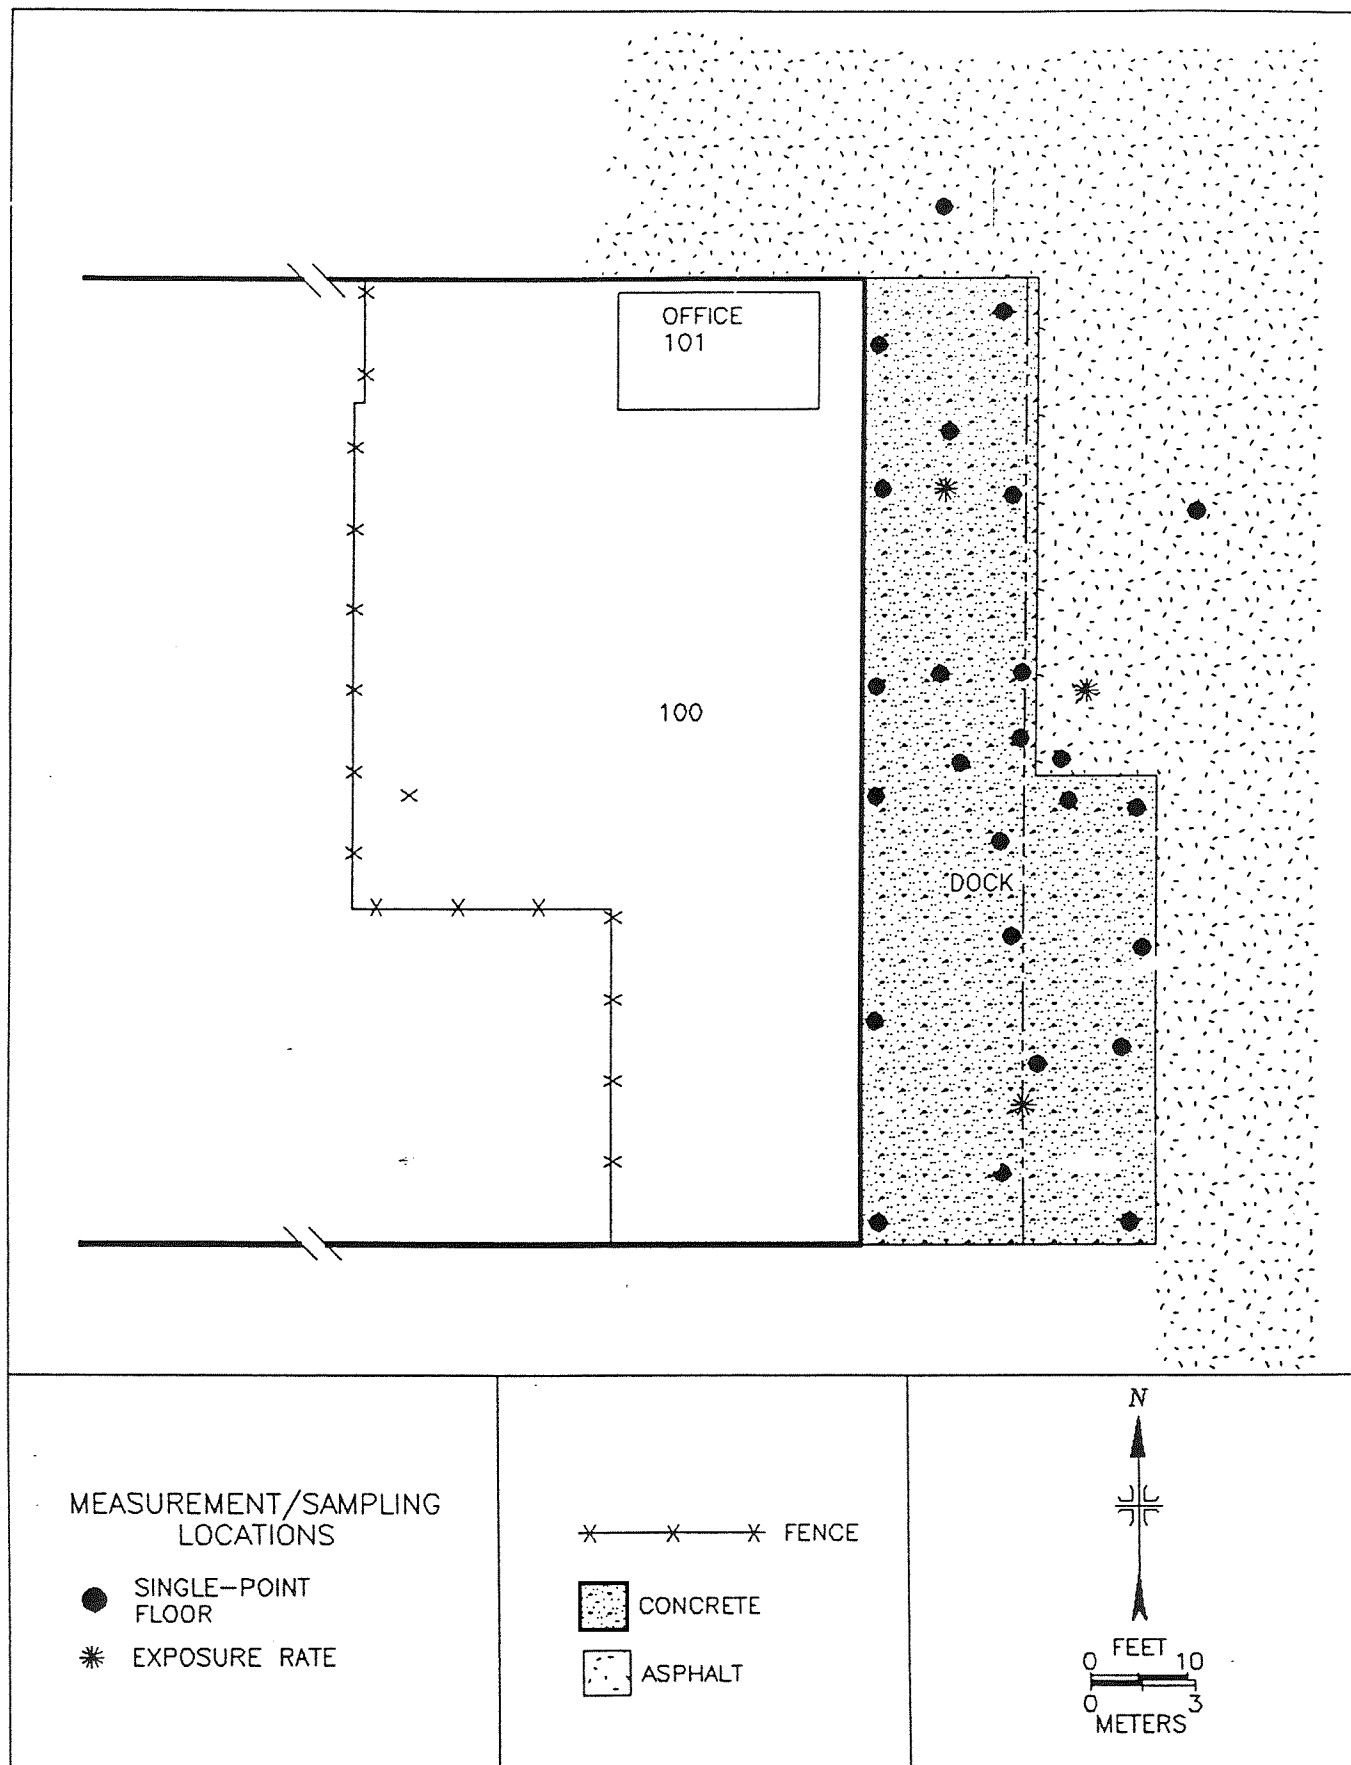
Building T641 — Floor Plan and Measurement and Sampling Locations
